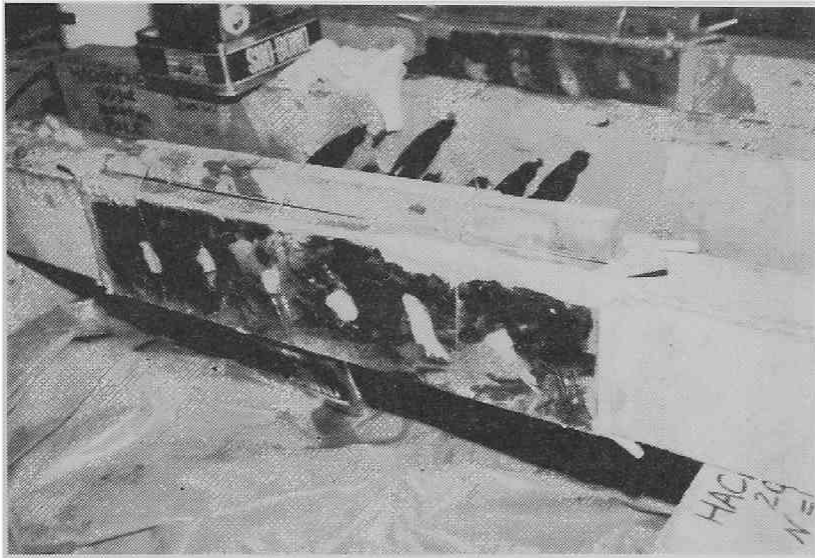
Type III repair: Setting steel plates around the specimen.
